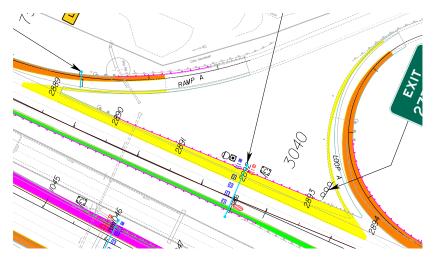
Split through traffic on I-64 WB bridge over Tidewater Drive
